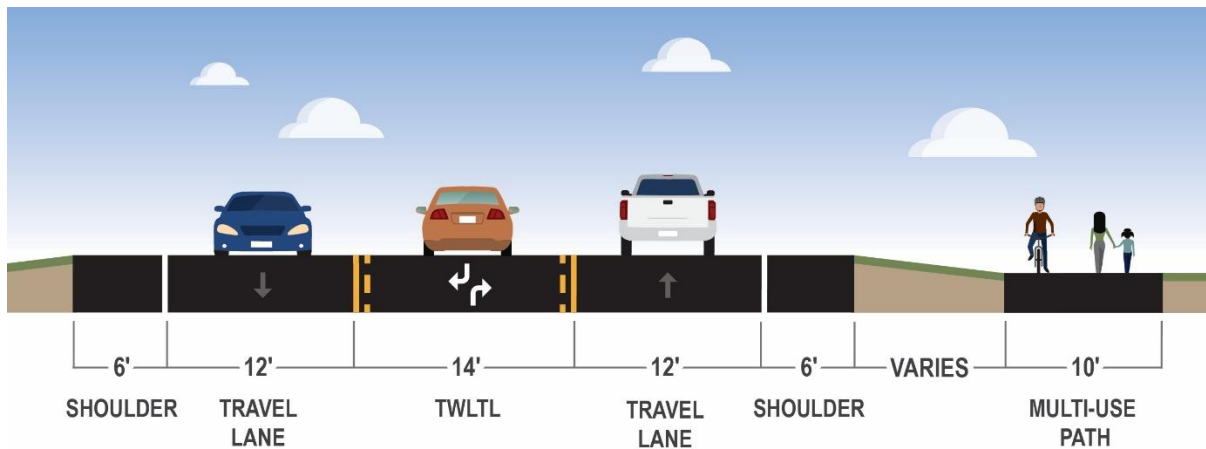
Proposed Cross Section on MT 3, East of Rod and Gun Club Road
